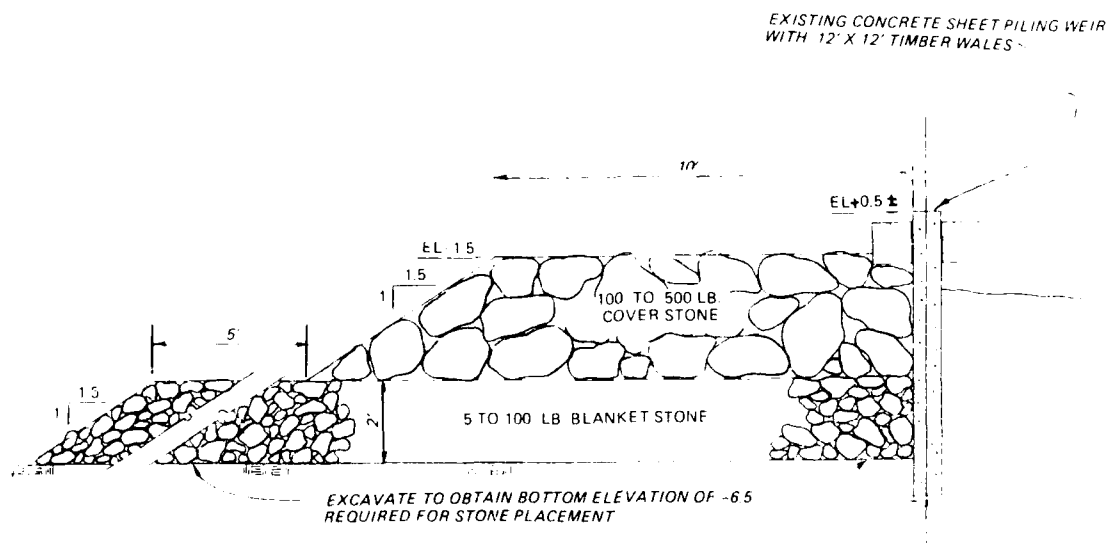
Design cross section of 1970 modification to the east jetty weir section at Perdido Pass
